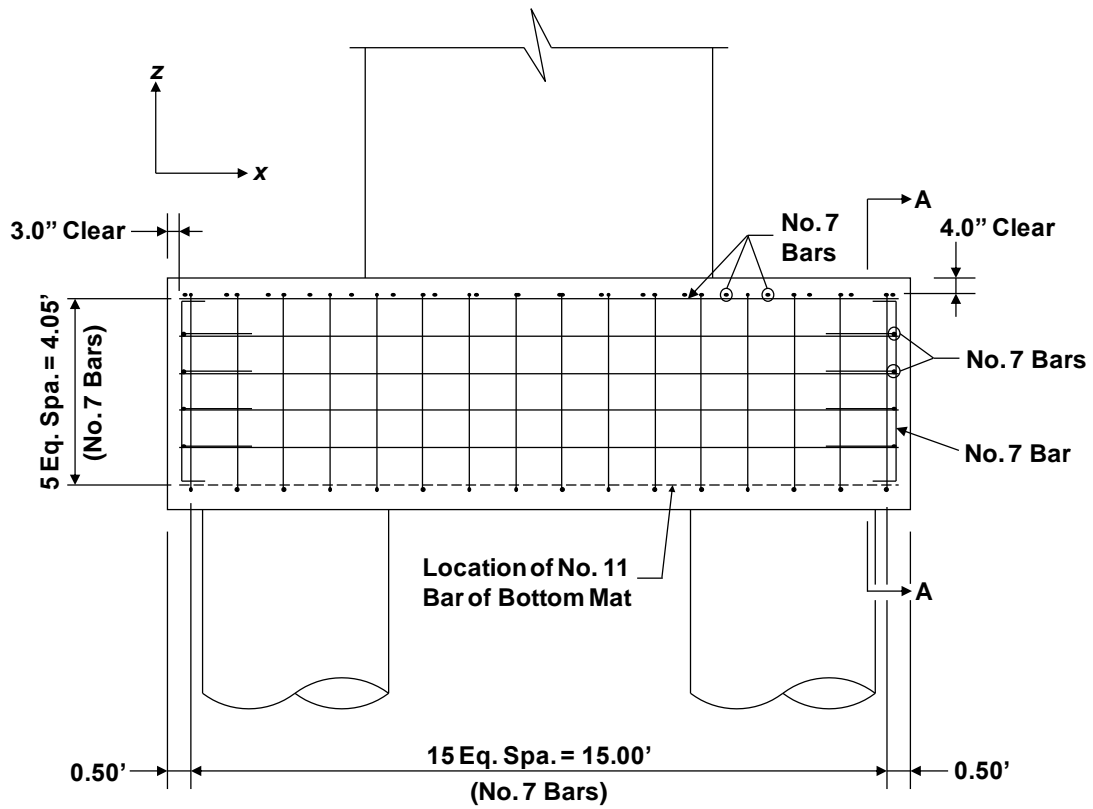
Reinforcement details – elevation view (shrinkage and temperature reinforcement)
